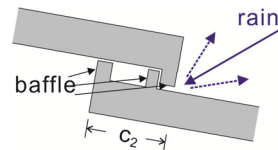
Prevention of splashing water leak using baffles in new Korean-style female roof tiles
